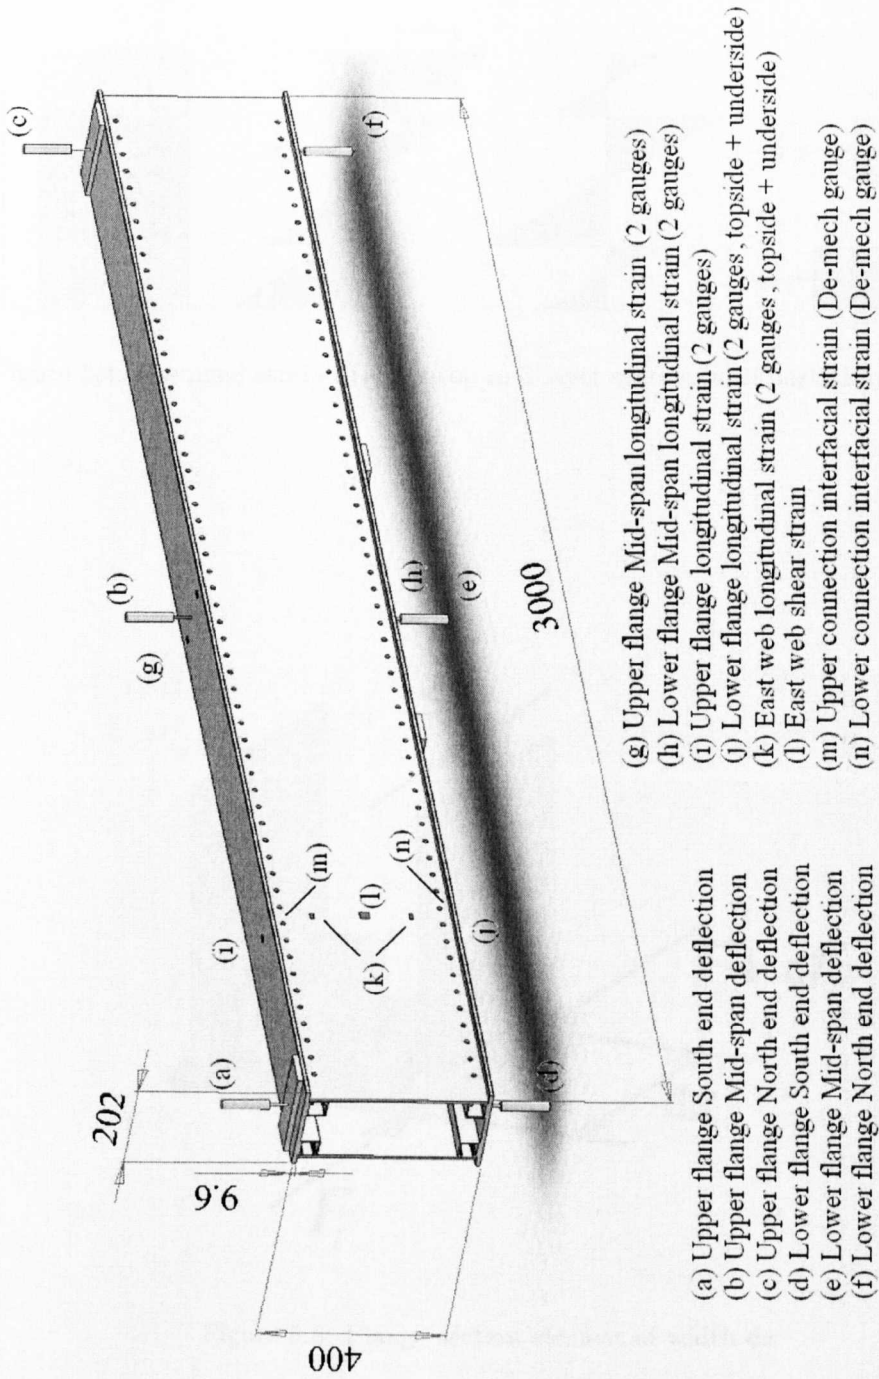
Experimental setup of Prototype Beam assembly with instrumentation positions (Dimensions in mm)
